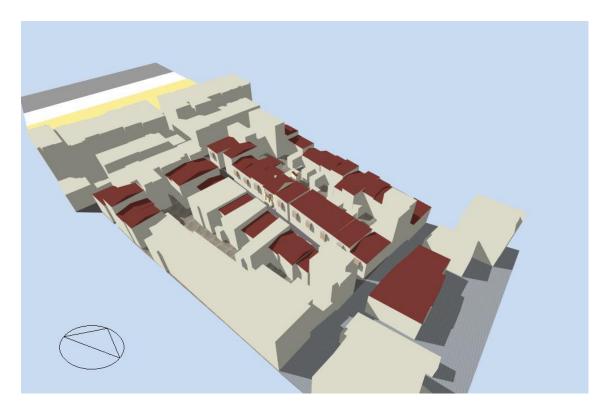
The site model of 1453 Street and its' surrounding in Alsancak
